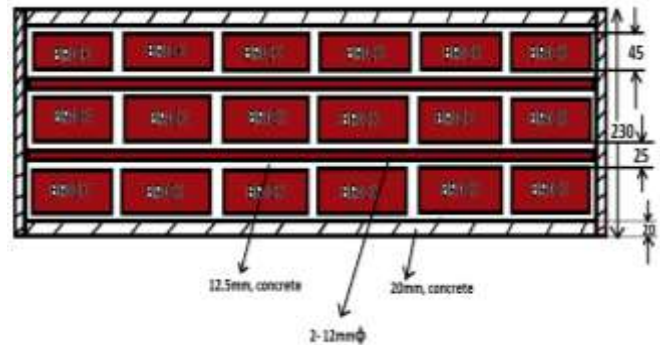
Arrangement of Bricks & Longitudinal Bars in Tension zone of Beam
